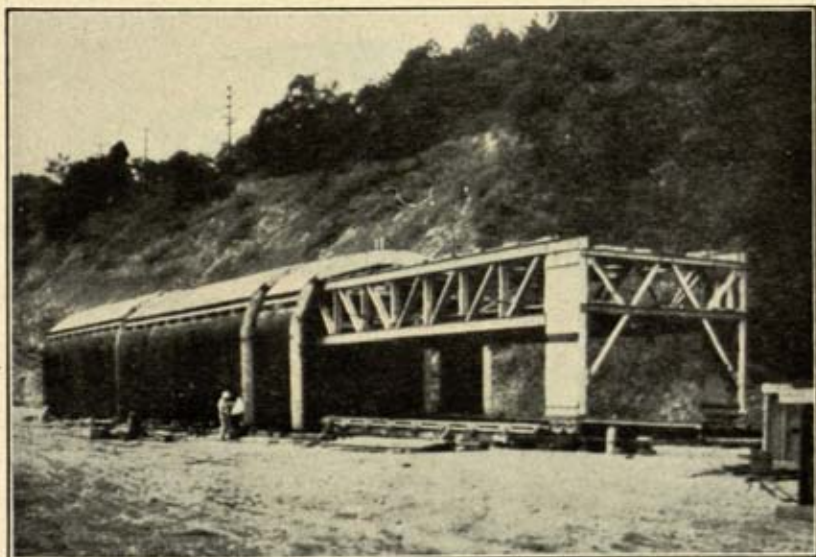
Three sections of steel forms used to place concrete lining in a tunnel. (Blaw-Knox Co.)
